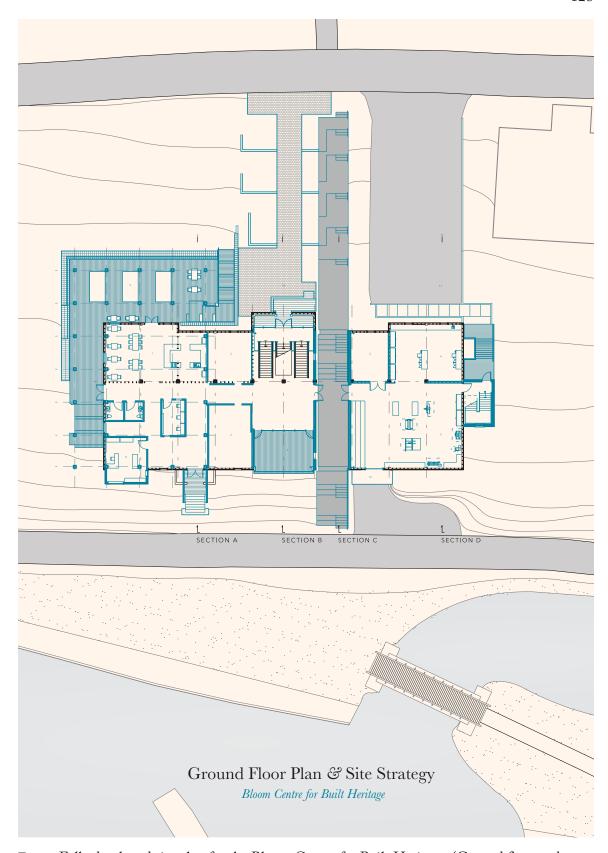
Fully developed site plan for the Bloom Centre for Built Heritage. (Ground floor and second floor plans are enlarged on the following pages).
